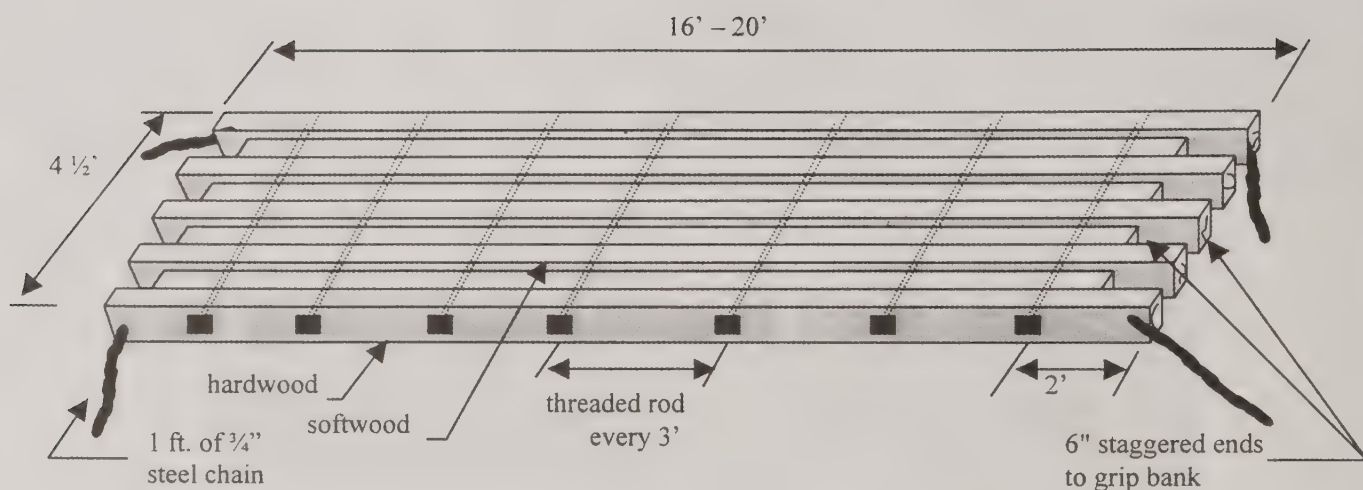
Plan view of a stress-laminated portable timber bridge segment constructed by the NYC Watershed Forestry Temporary Bridge Program.
